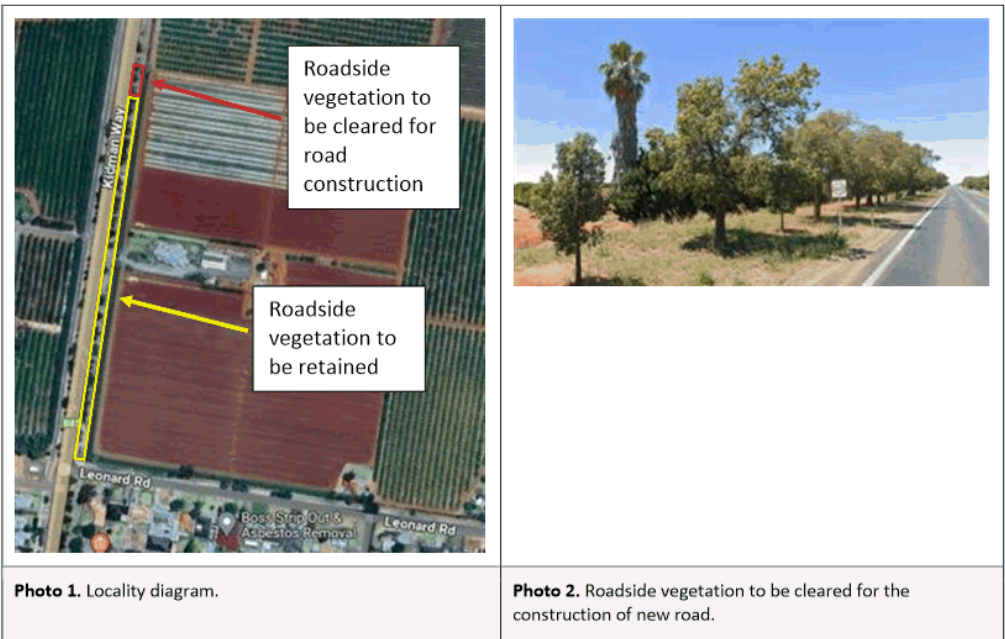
Area of road reserve to be impacted on Kidman Way (northwest corner of the site).
